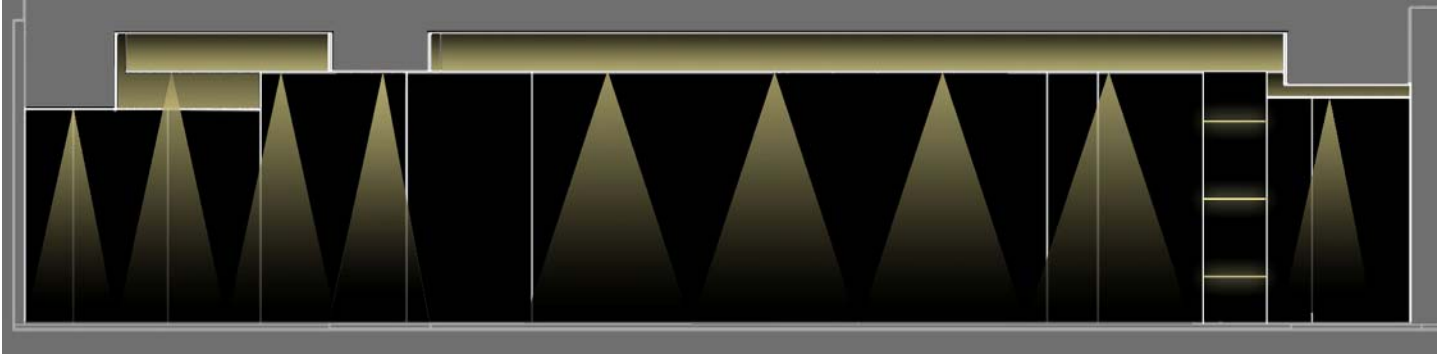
Photoshop rendering of proposed elevation.
